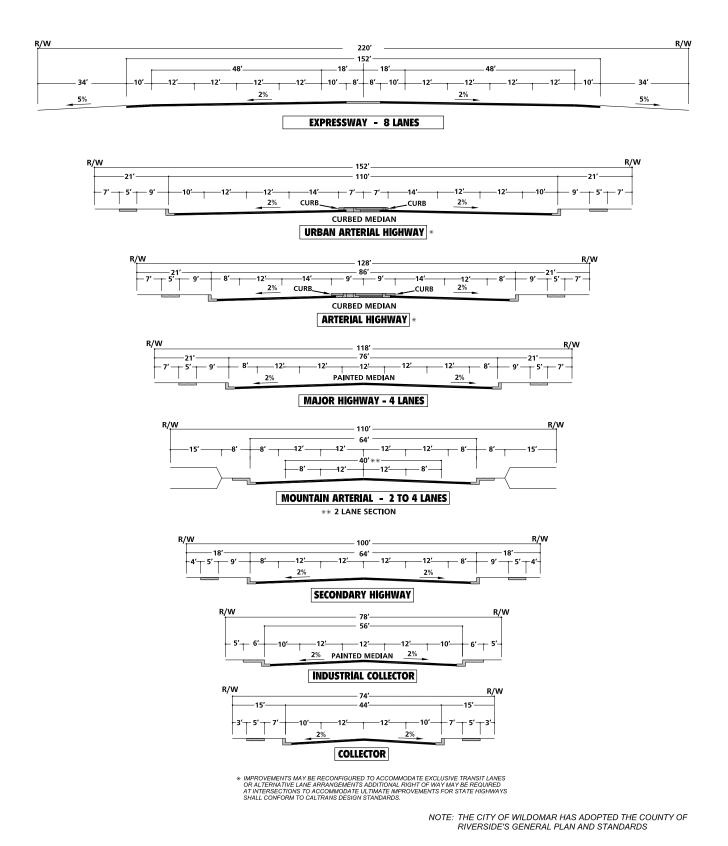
CITY OF WILDOMAR GENERAL PLAN ROADWAY CROSS-SECTIONS
